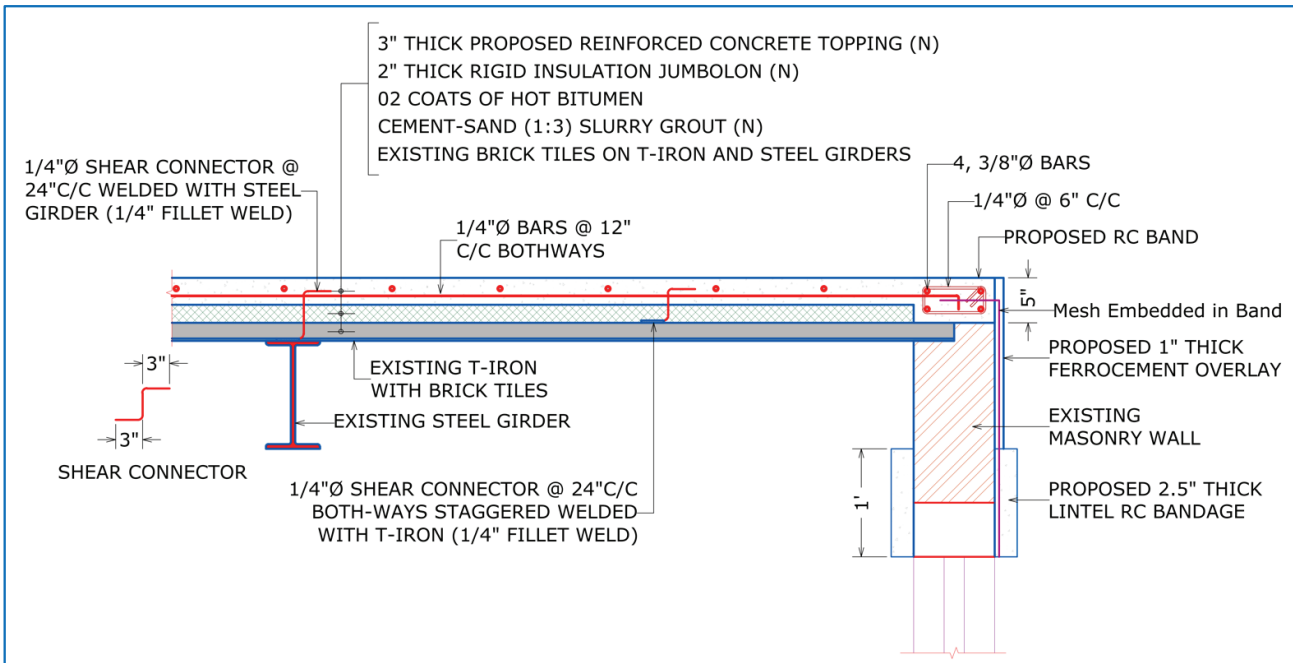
Strengthening of steel girder and inverted tee floor and roof (one storey)
